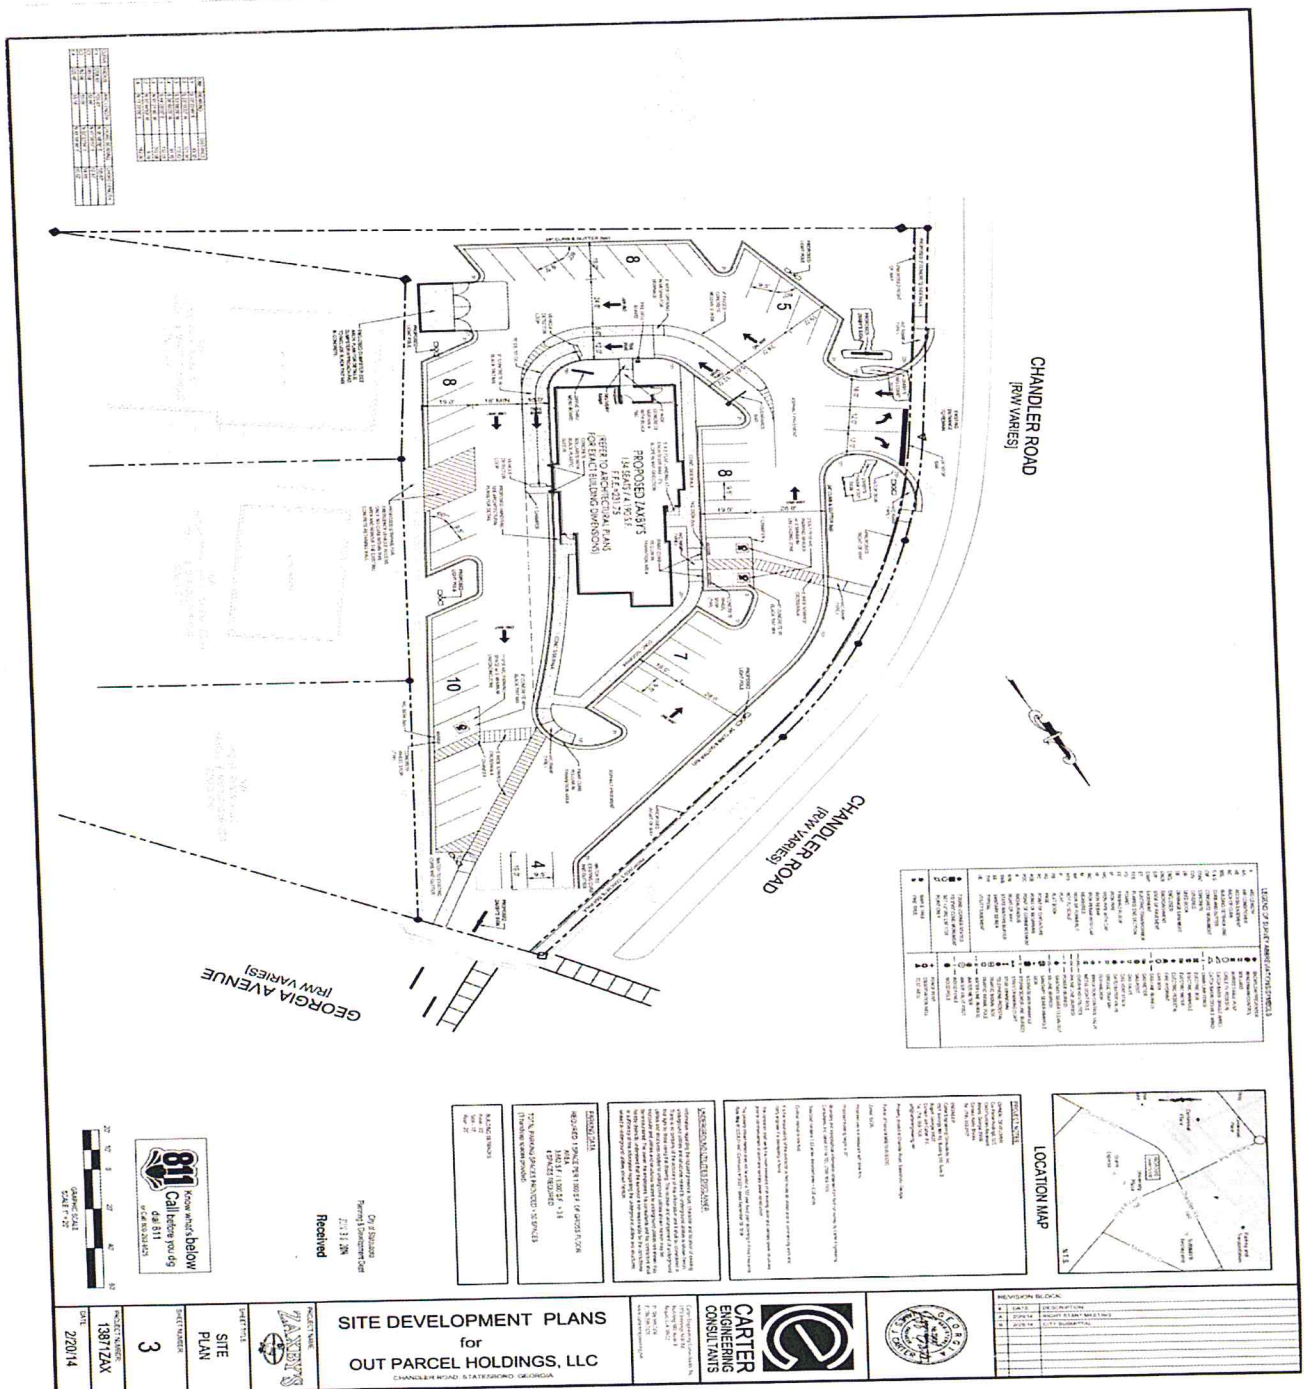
EXHIBIT B: SIGN & SITE PLAN CONT'D
